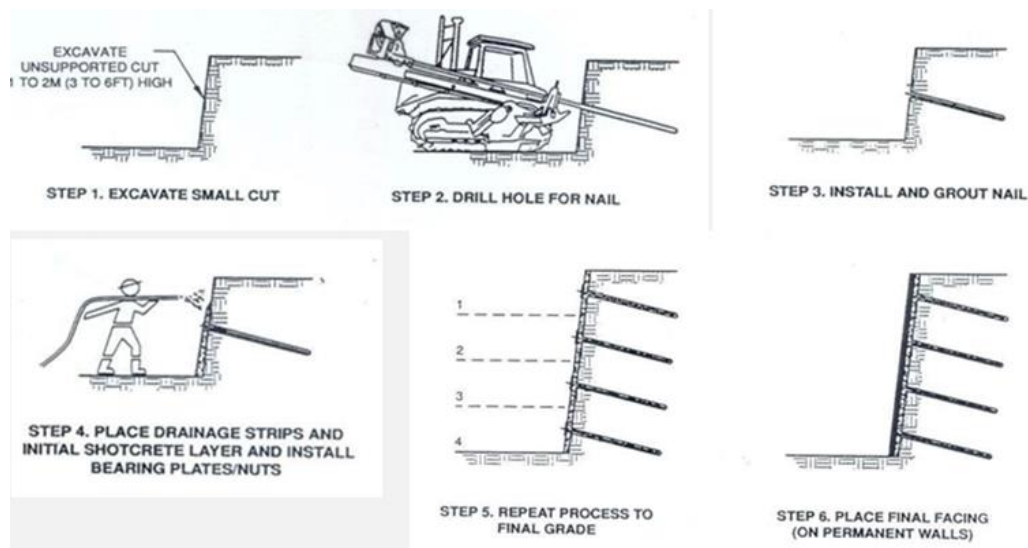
Stages of construction of a conventional soil nail/shotcrete wall (FWHA, 2003).
